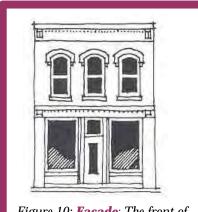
Façade: The front of a building; also any side of a building facing a public way or space.
